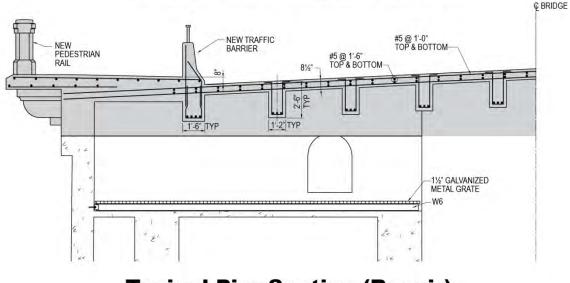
Typical Repair Sections - Alternative A
